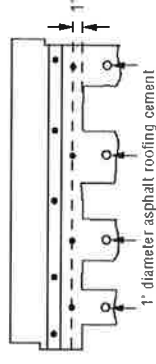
Fastening Presidential and Presidential TL Shake shingles on steep slopes.
